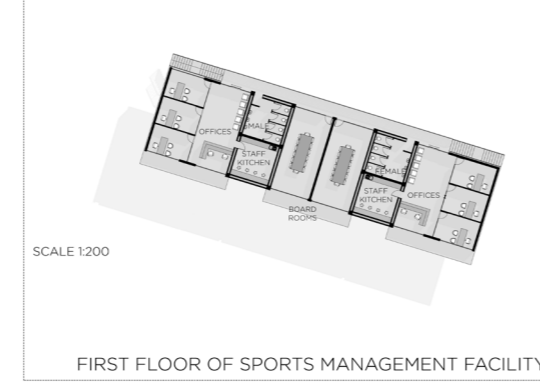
First Floor Plan of the Design in the June Exam (Author, 2018)
